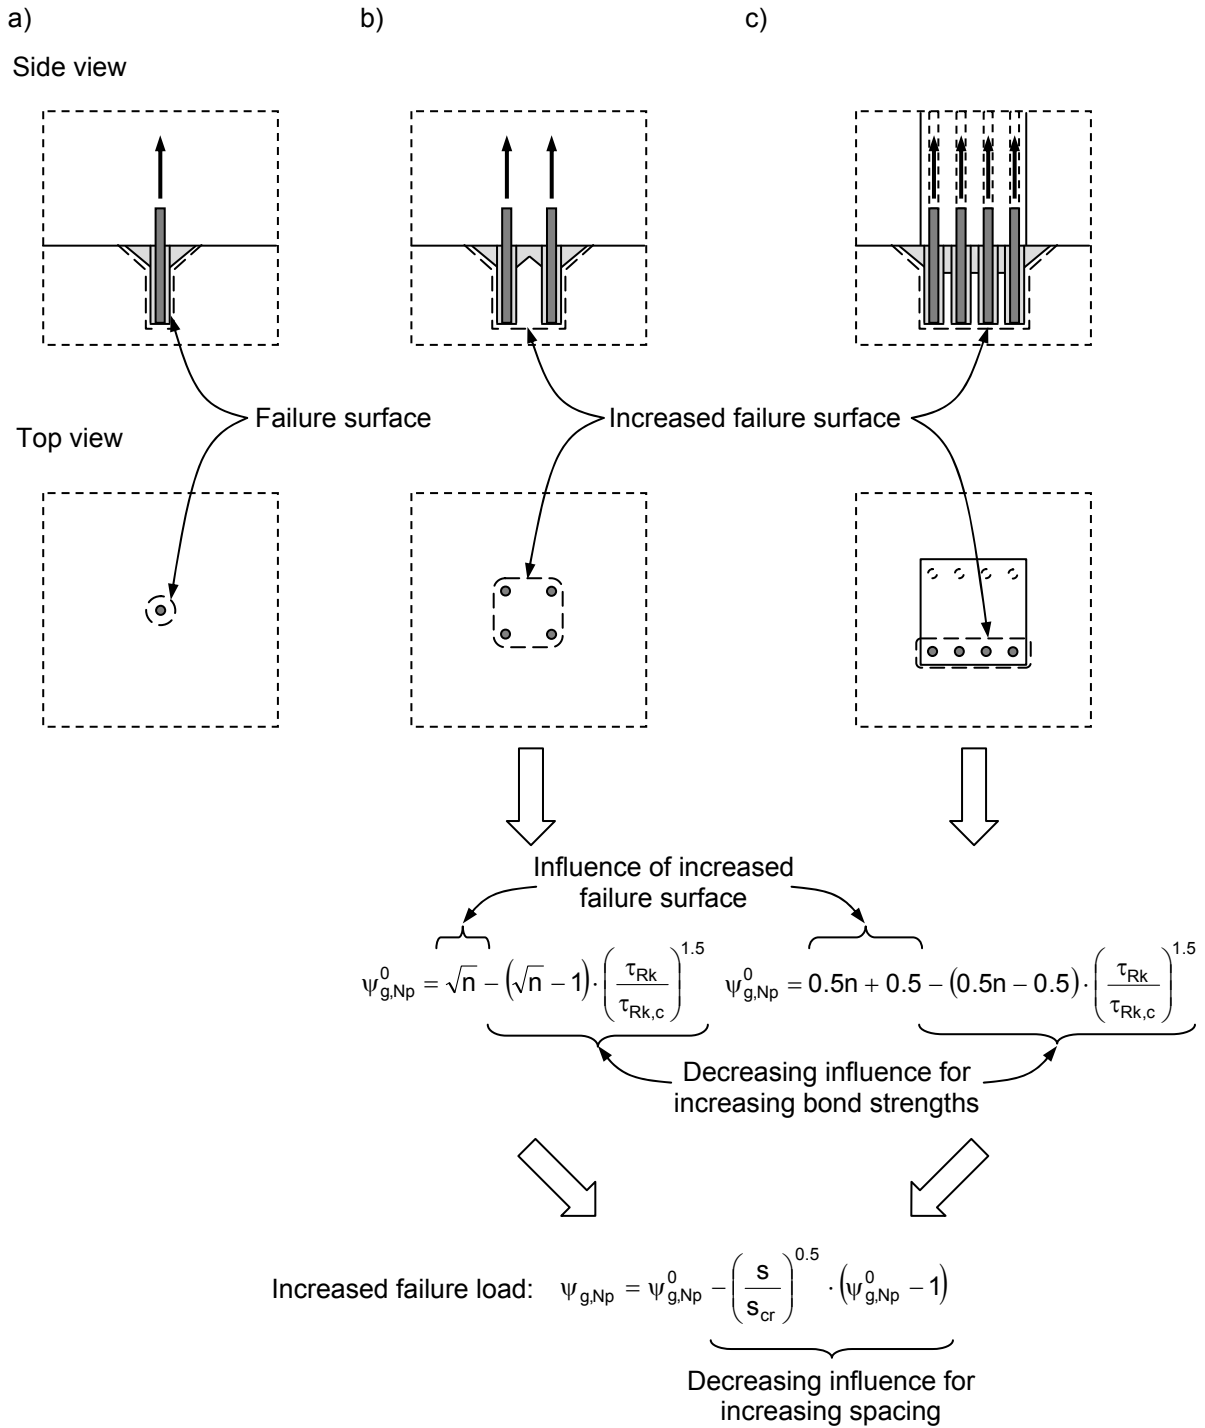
a) Failure surface for single anchor as well as increase of failure surface and failure load for b) tightly arranged anchor group after *Eligehausen, R.; Cook, R. et al. (2006)* and c) linear arranged anchor group of column-to-foundation connection after *Herzog, M. (2010)
